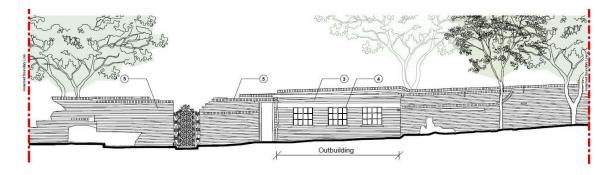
Existing rear elevation as viewed from No.20 Perrin's Walk
